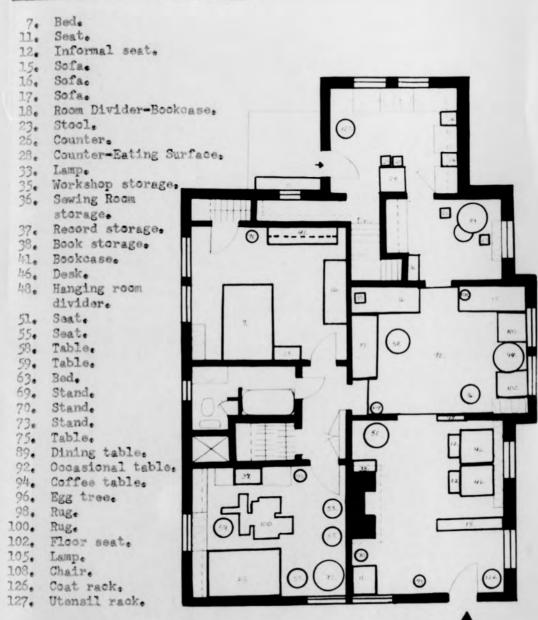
Floor plan showing furnishings used to furnish six-room apartment.
